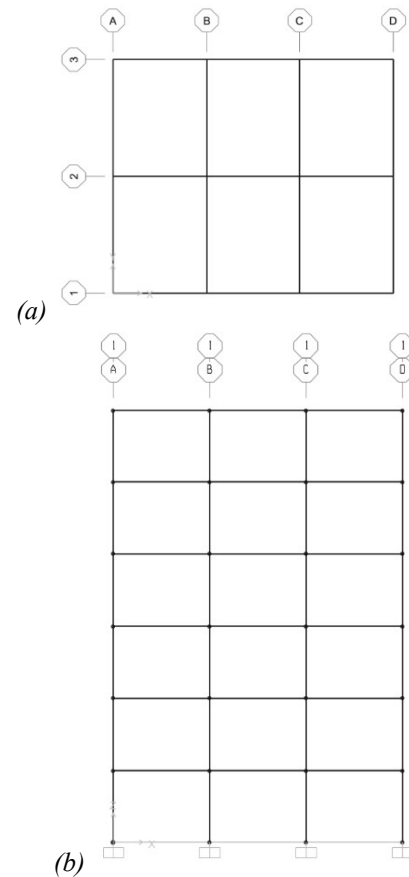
Details of building used in the present analysis (a) plan and (b) elevation
